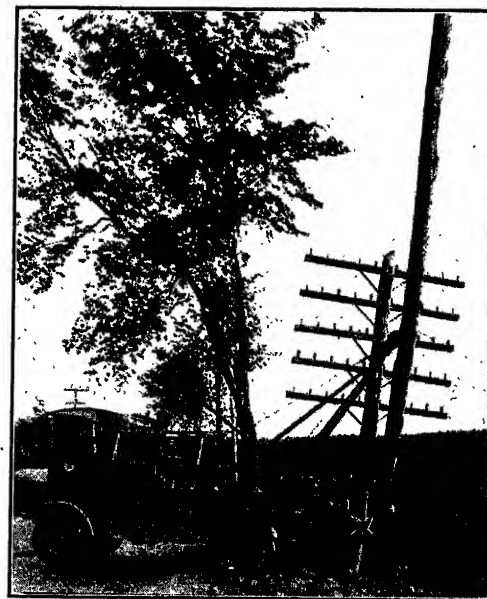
EARTH BORING MACHINE AND DERRICK ON FOUR-WHEEL DRIVE TRUCK
